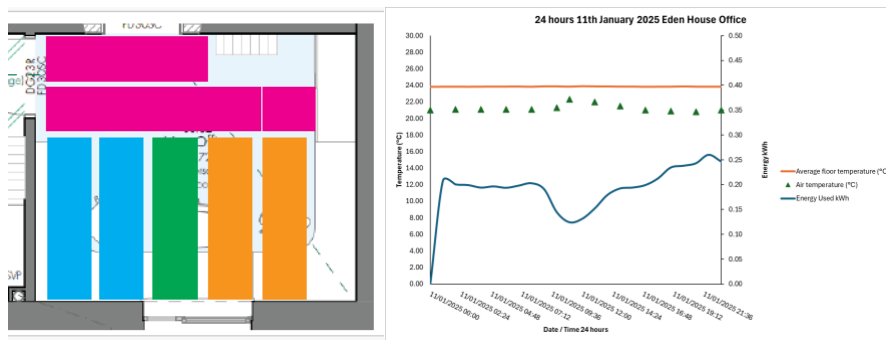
(Left) Floor plan zonal layout of Eden House Test room (Right) Floor temperature, air temperature and power consumption of Eden House Test room over 24 hours
